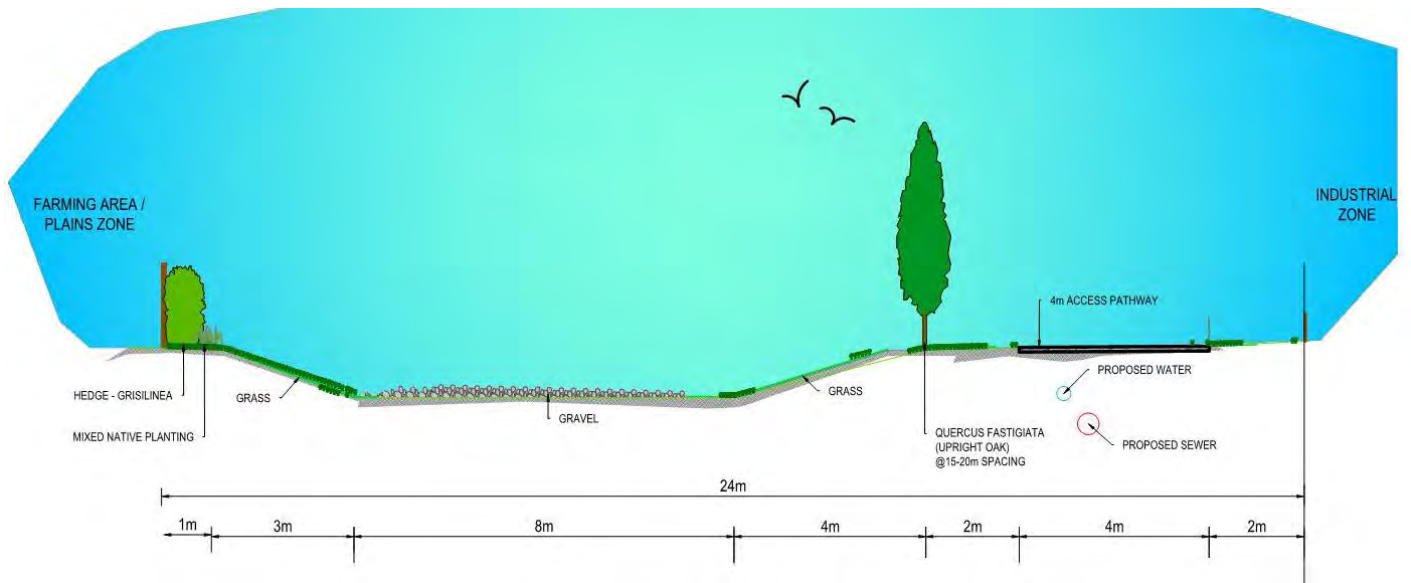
Cross Section of Stormwater Swale and Access Corridor Strip.
